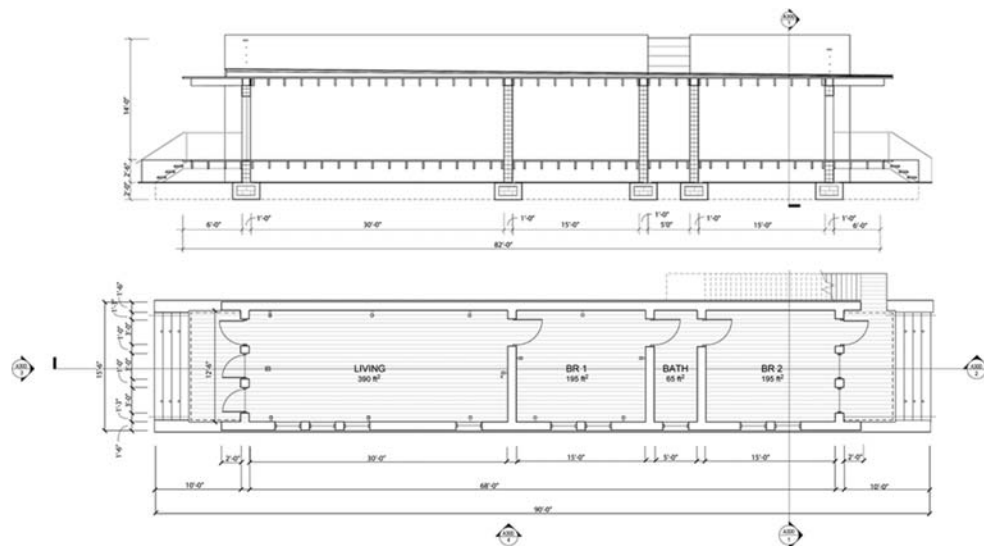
Shotgun housing prototype plan (bottom) and section (top) drawings. Source: (Author)
